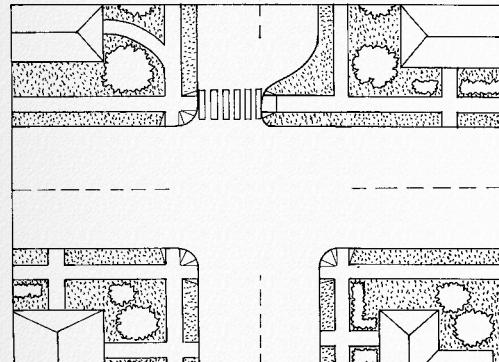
Half closures, similar to full closures, are barricades located in the street and constructed of landscaped walls, gates, side-bollards, or other obstructions.
